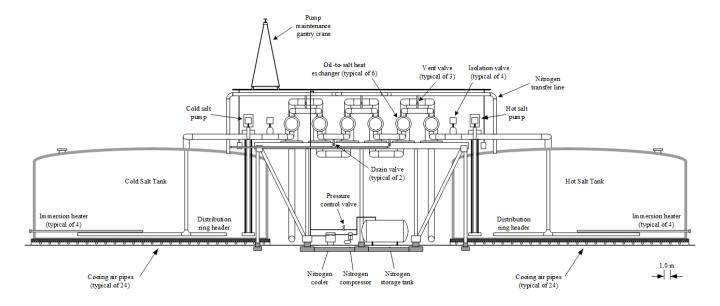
Elevation View of Thermal Storage Tanks and Oil-to-Salt Heat Exchangers
